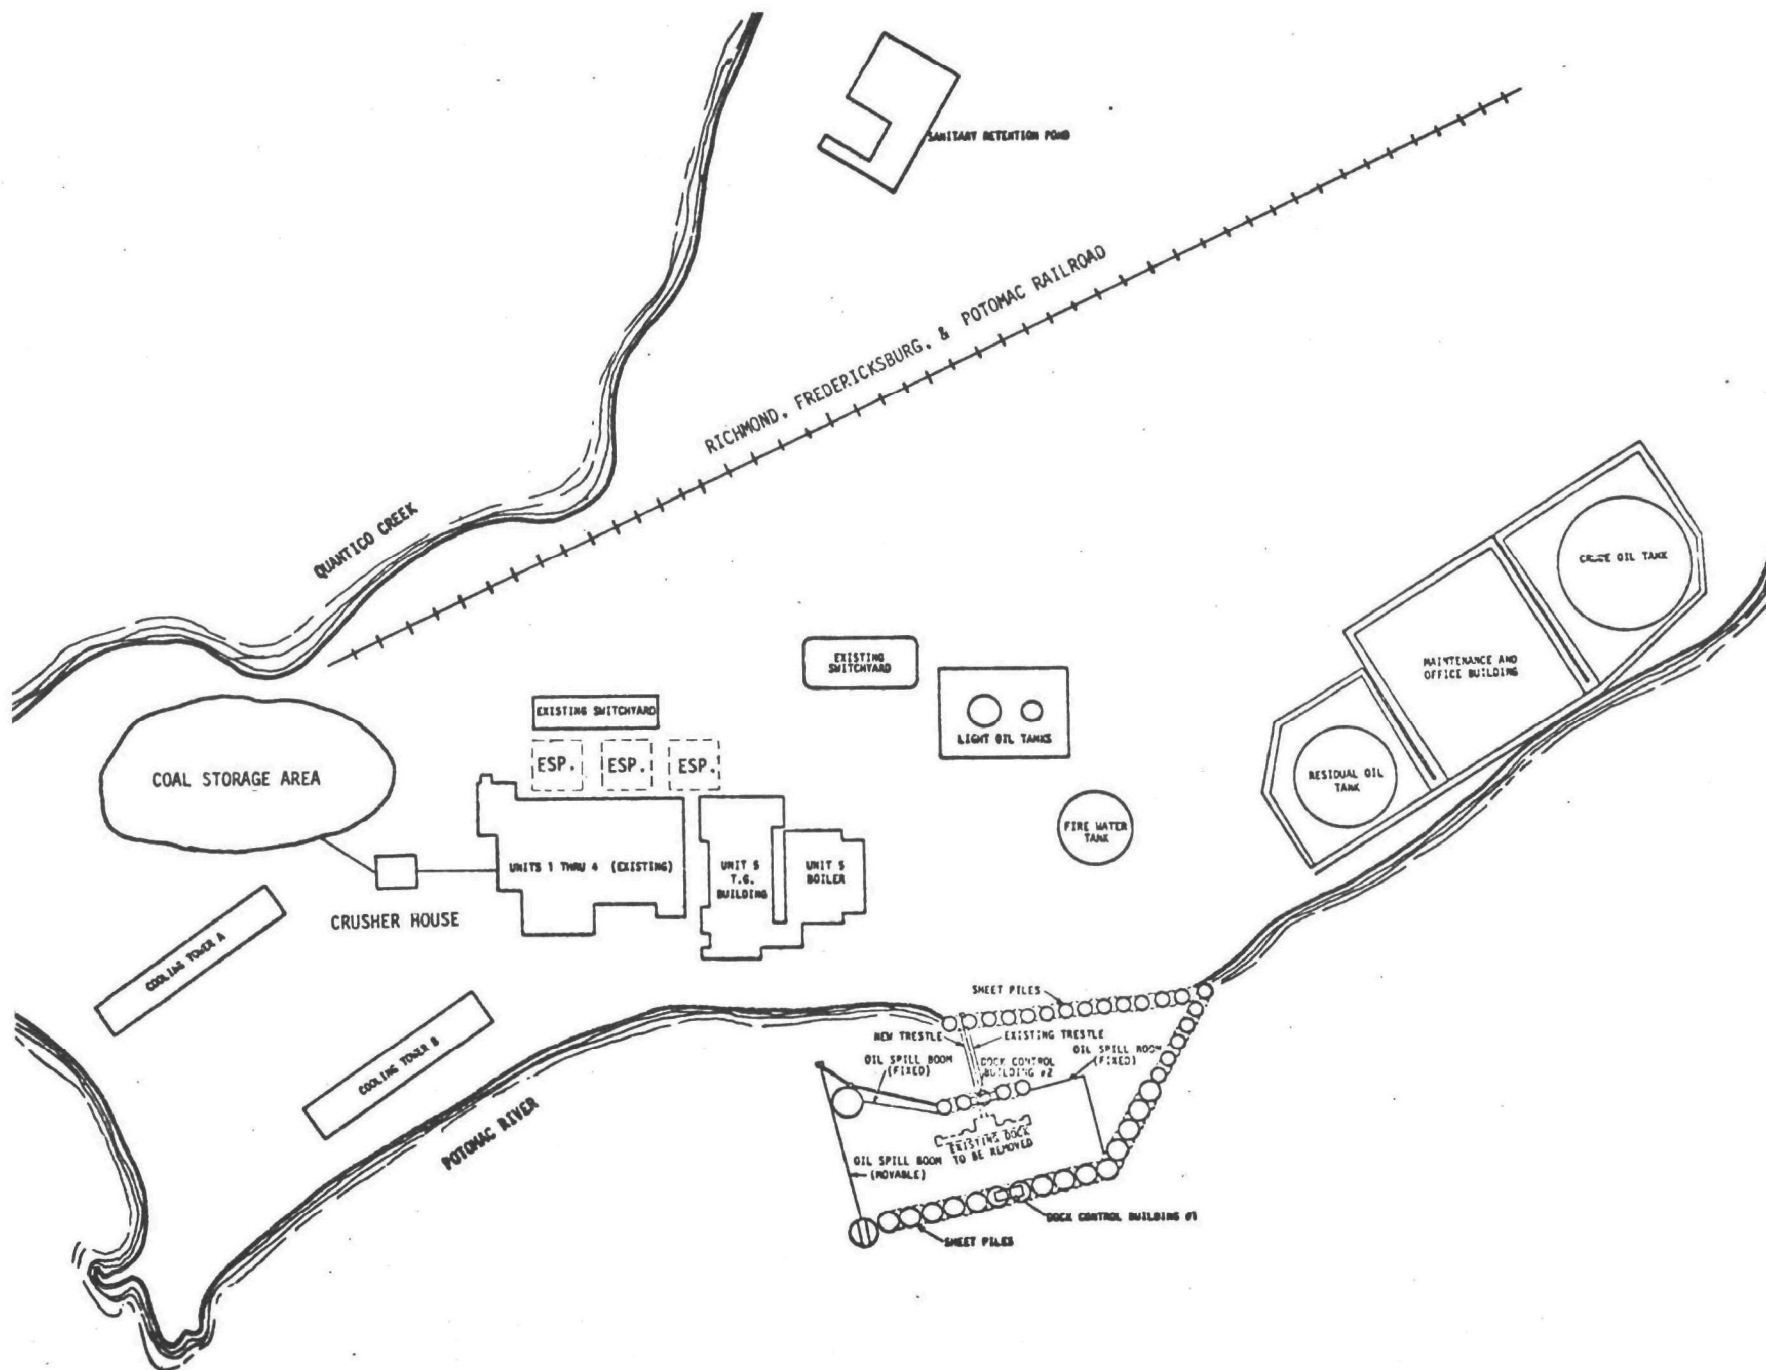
Site plan showing possible locations of new ESP's for Boilers 2, 3, and 4 at the Possum Point power plant.
